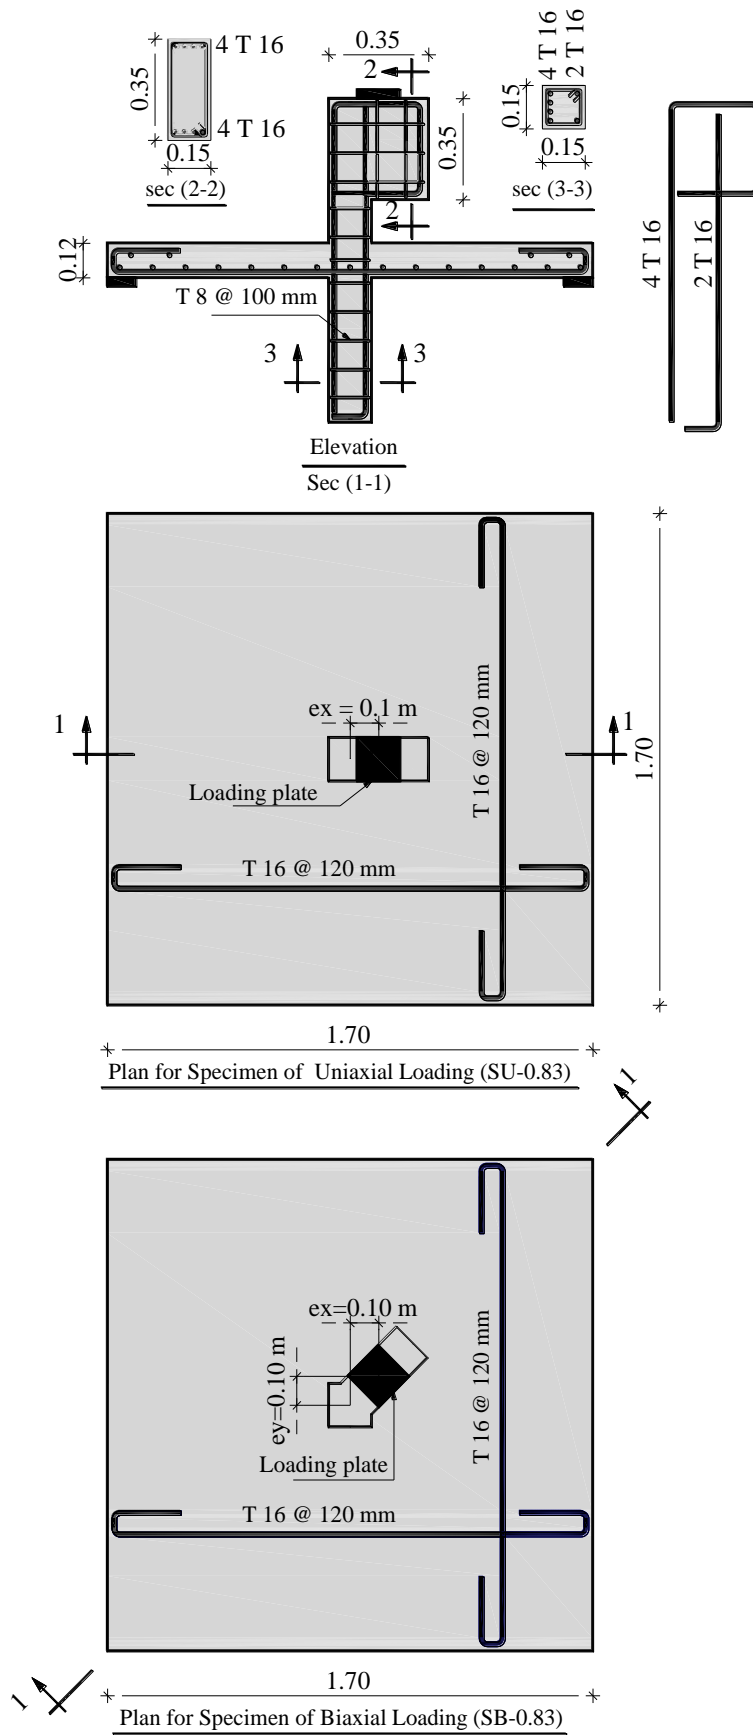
Reinforcement details for specimens of uniaxial and biaxial loading.
